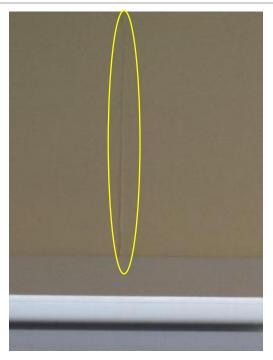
Vertical Hairline Crack at Wall Lining Joint on South Wall in L1 Main Room
